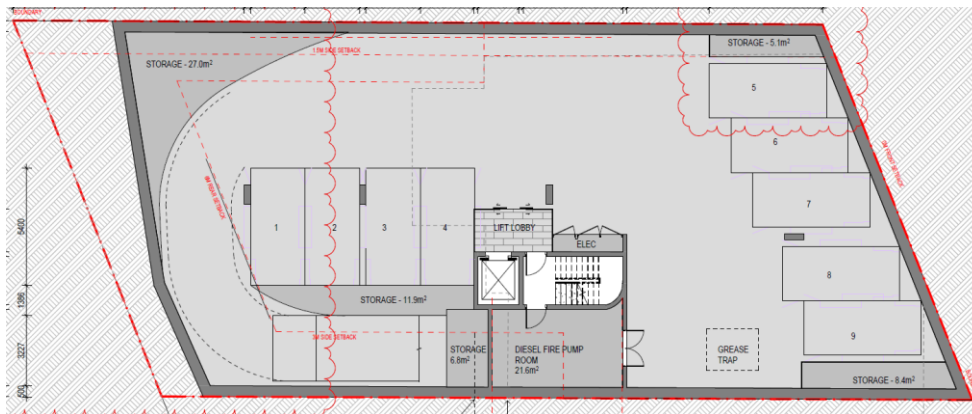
Proposed basement 2 plan - 18-20A Perouse Road, Randwick (Source: Curzon & Partners)
